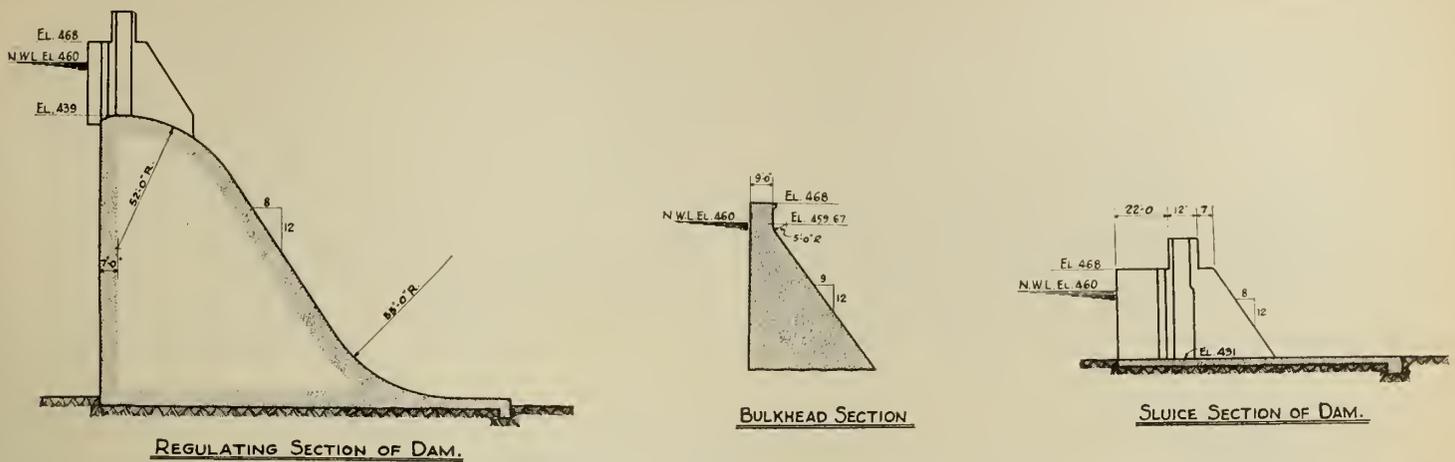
Paugan Development—Typical Sections Through Dam.
